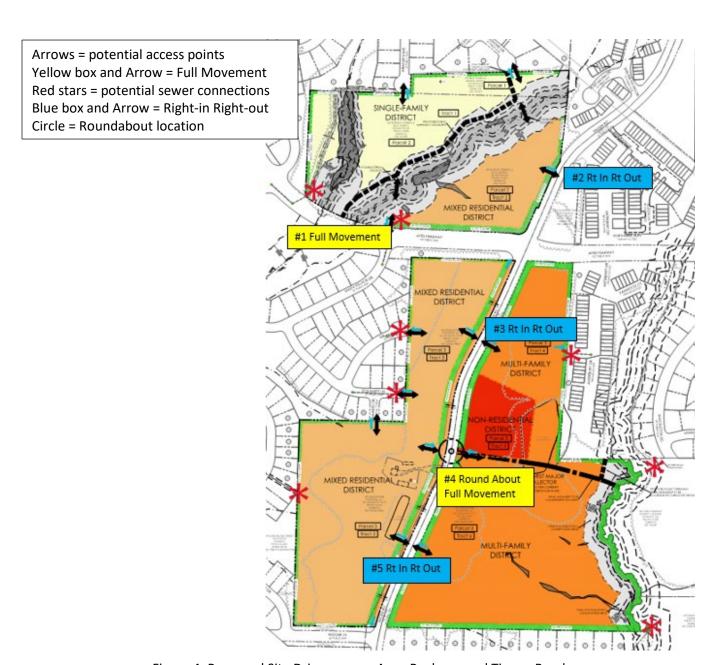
Proposed Site Driveways on Apex Peakway and Tingen Road
